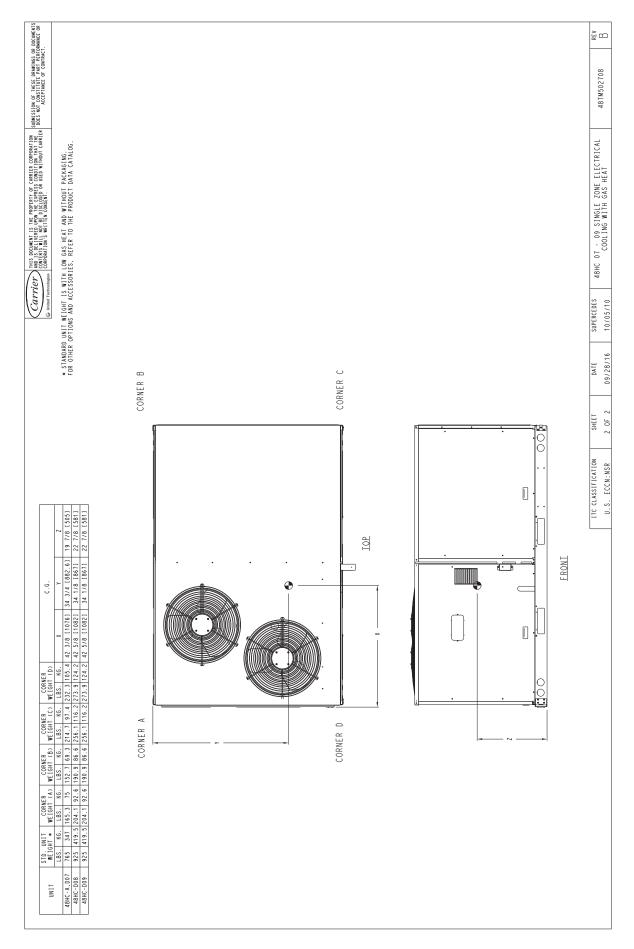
Unit Dimensional Drawing — Sizes 07-09 (cont)
